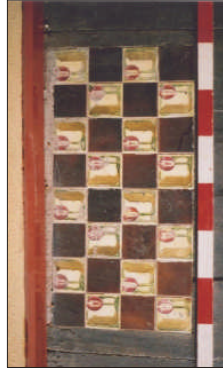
Art Nouveau tiles, re-set into the bedroom floor of the cottage.
